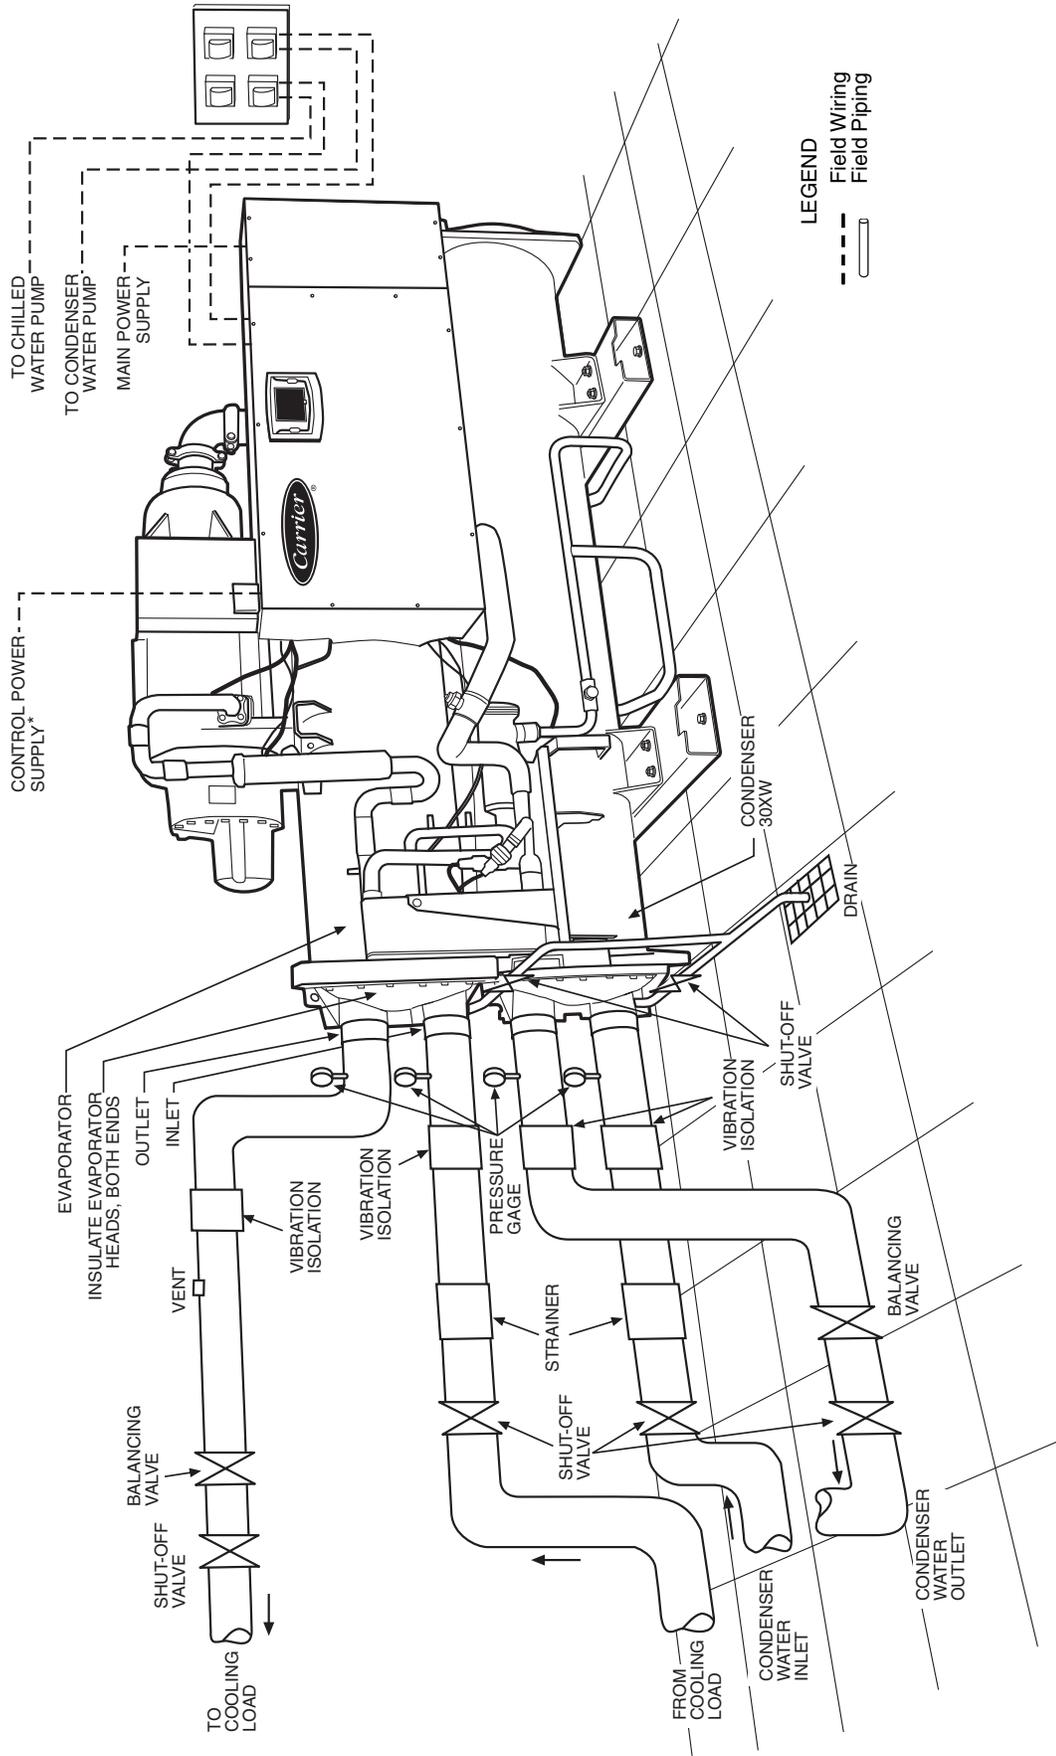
Typical Evaporator and Condenser Piping and Wiring — 30XW150-300
